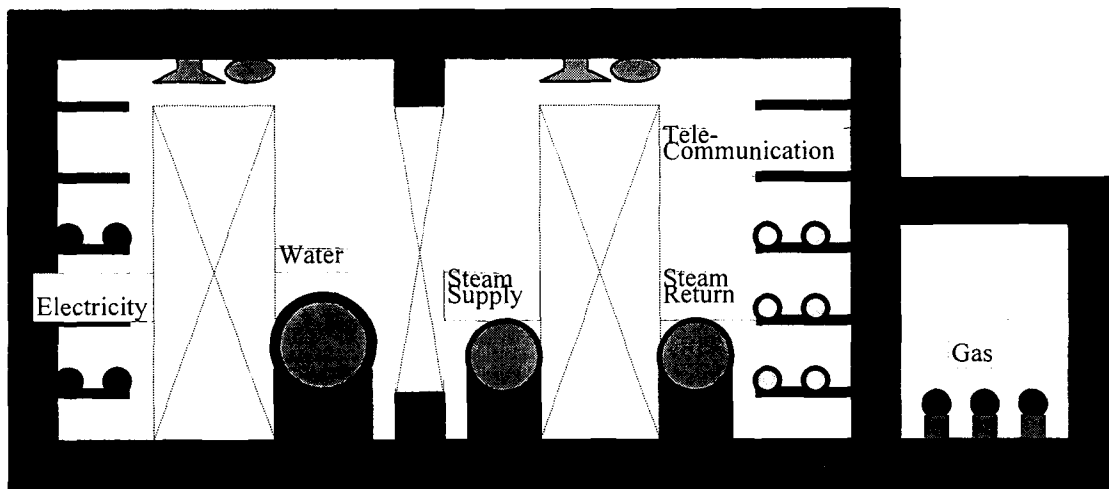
Example of standard section of utility tunnel module fitting w/ Korea
